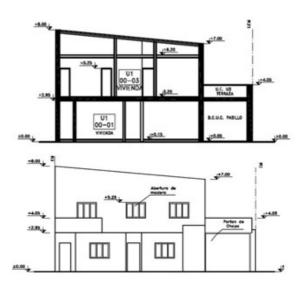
Facade and cross-sections identifying heights relative to the floor
